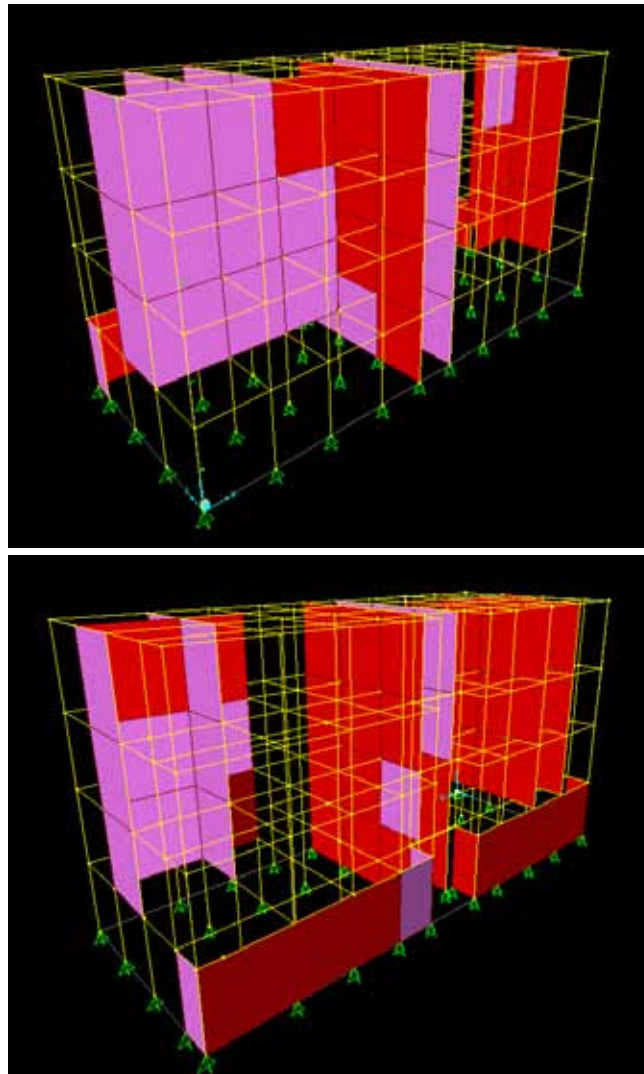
SAP2000 Structural Model. Top Image Shows Front Facade, Bottom Picture Shows Rear of Building.
